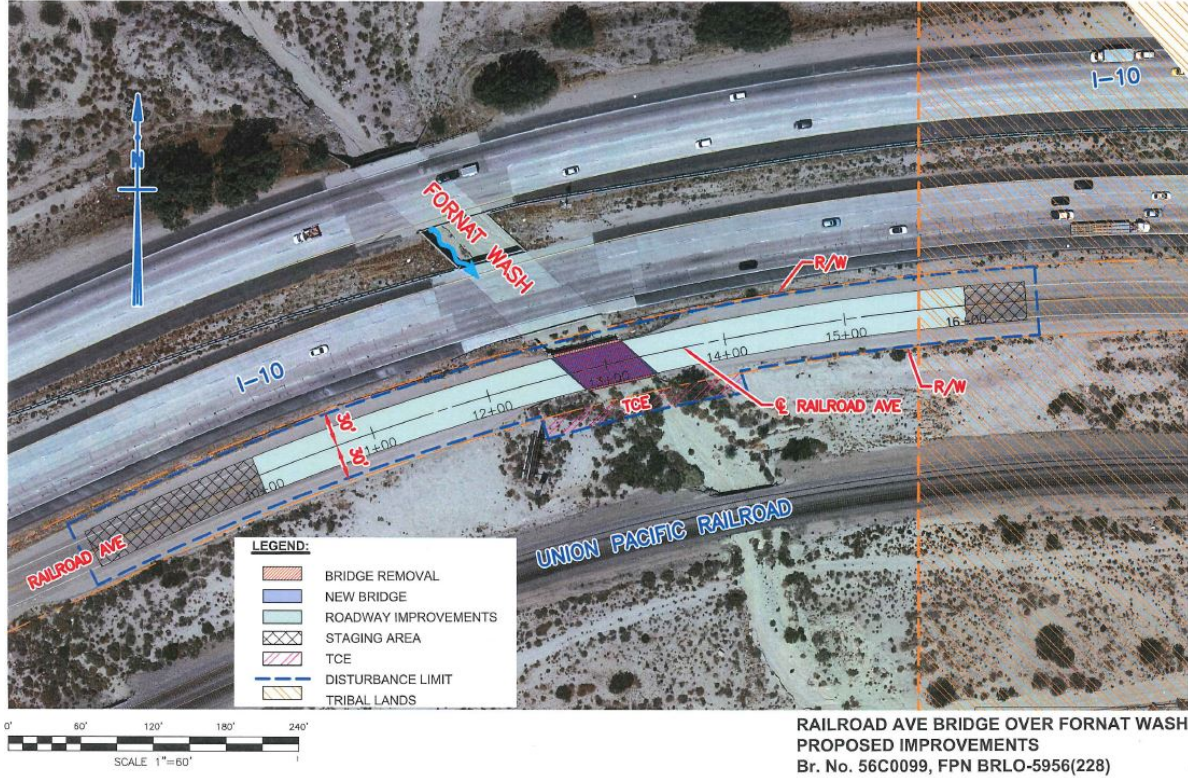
Proposed Improvements for Bridge over Fornat Wash
